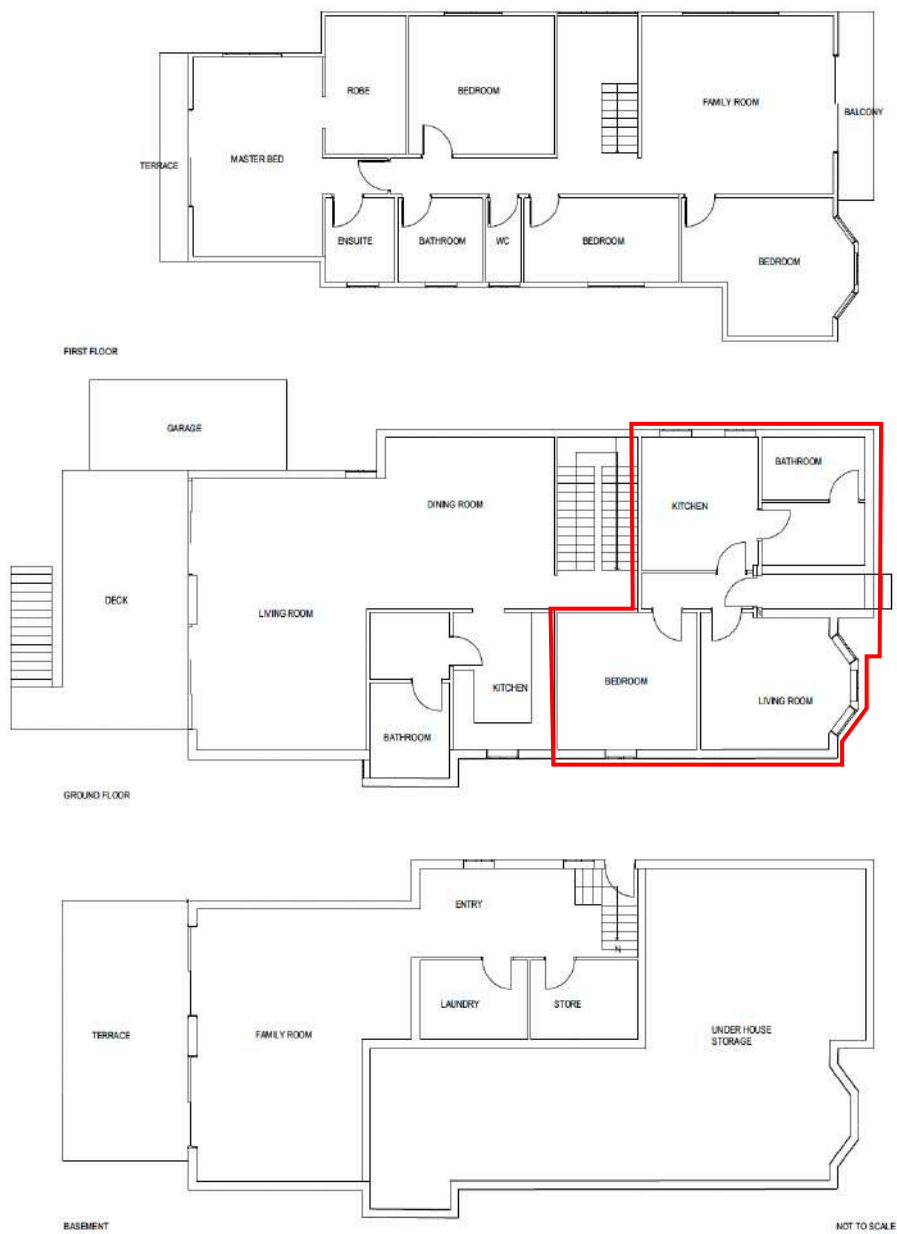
Approximate basement, ground floor and first floor plans of No. 31 Dover Road. The front unit is outlined in red. Weir Phillips Heritage, 2025.
